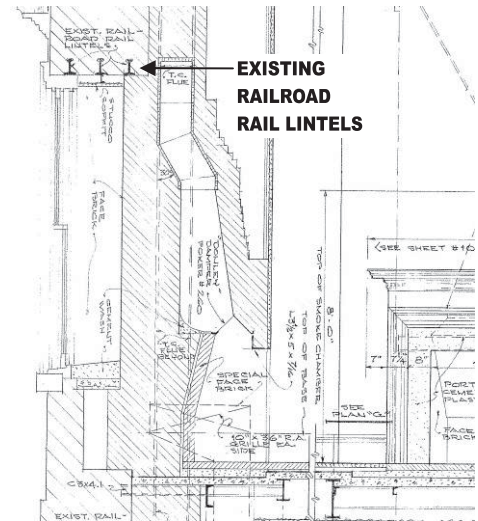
The 1970s drawings depict 3 existing lintels above the first floor windows. (Detail from Ballou, D-4)
